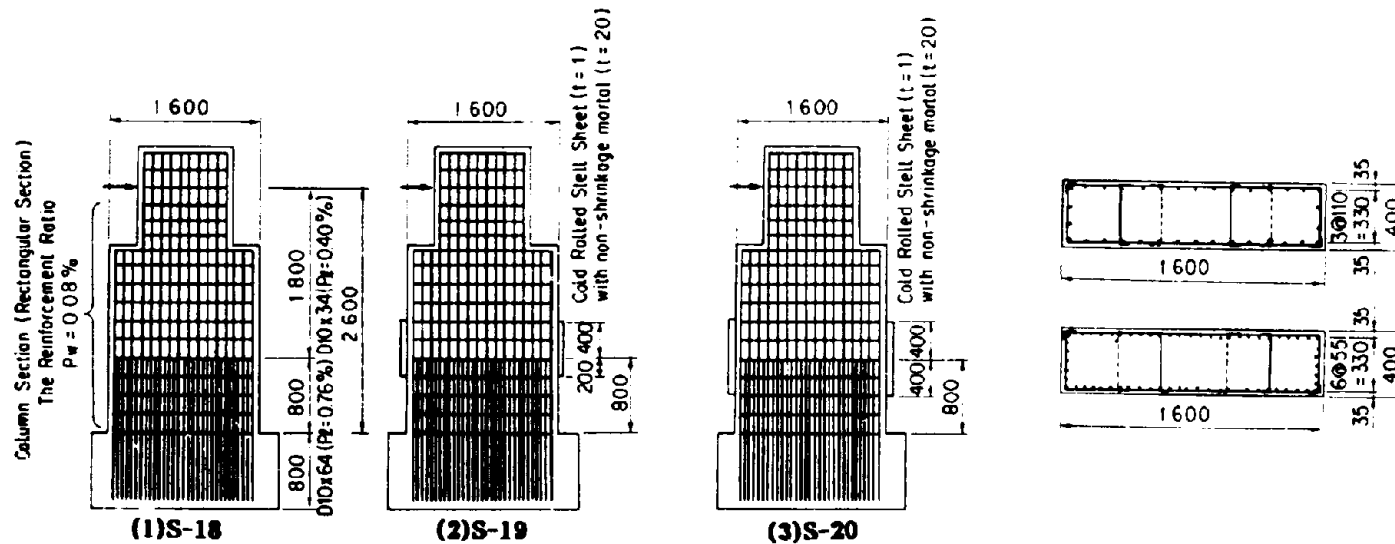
Reinforced Concrete Pier Specimens with Shear Span Ratio of 5.4 to study Effect of Anchorage Length of Main Reinforcement
